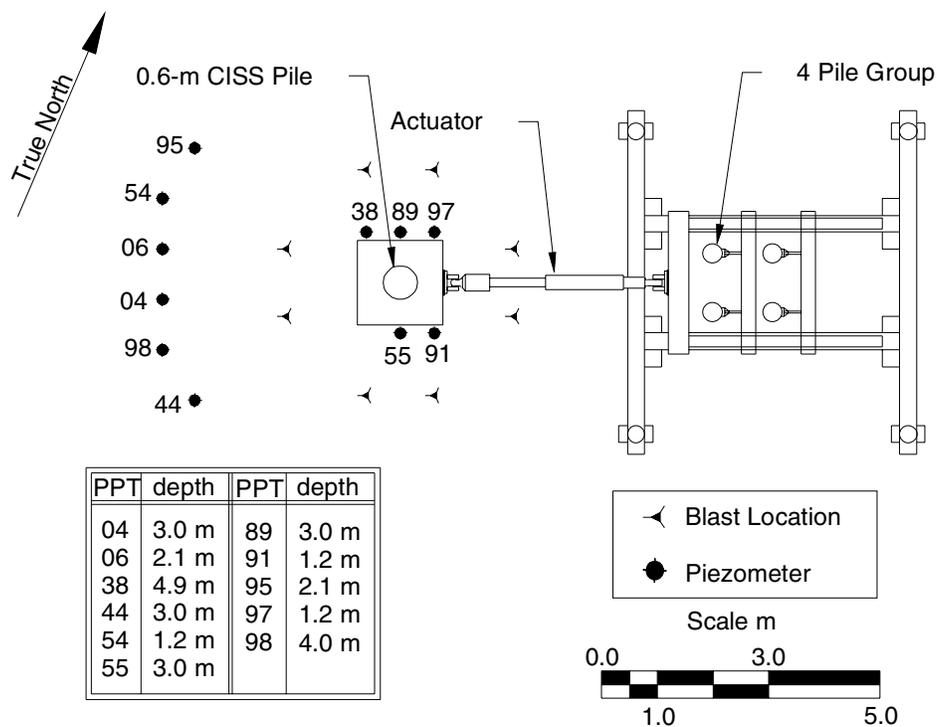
Test Setup and Location of Piezometers and Explosives Before Stone Column Installation
